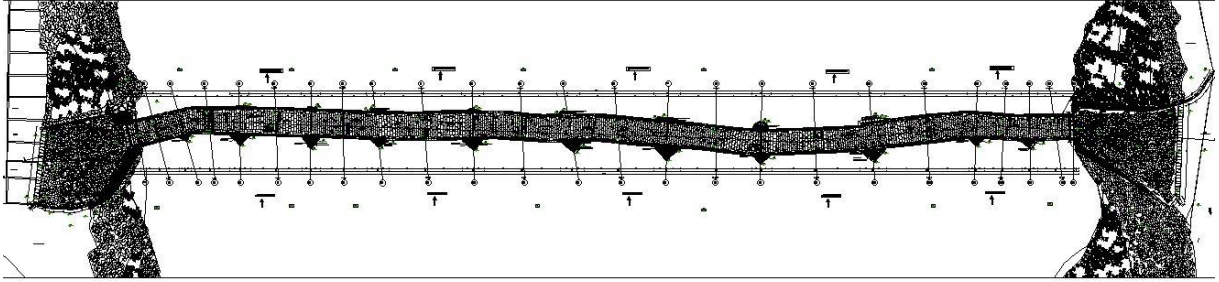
Historical Murat Bridge Plan View (illustrator Mehmet Sakir Guler)
